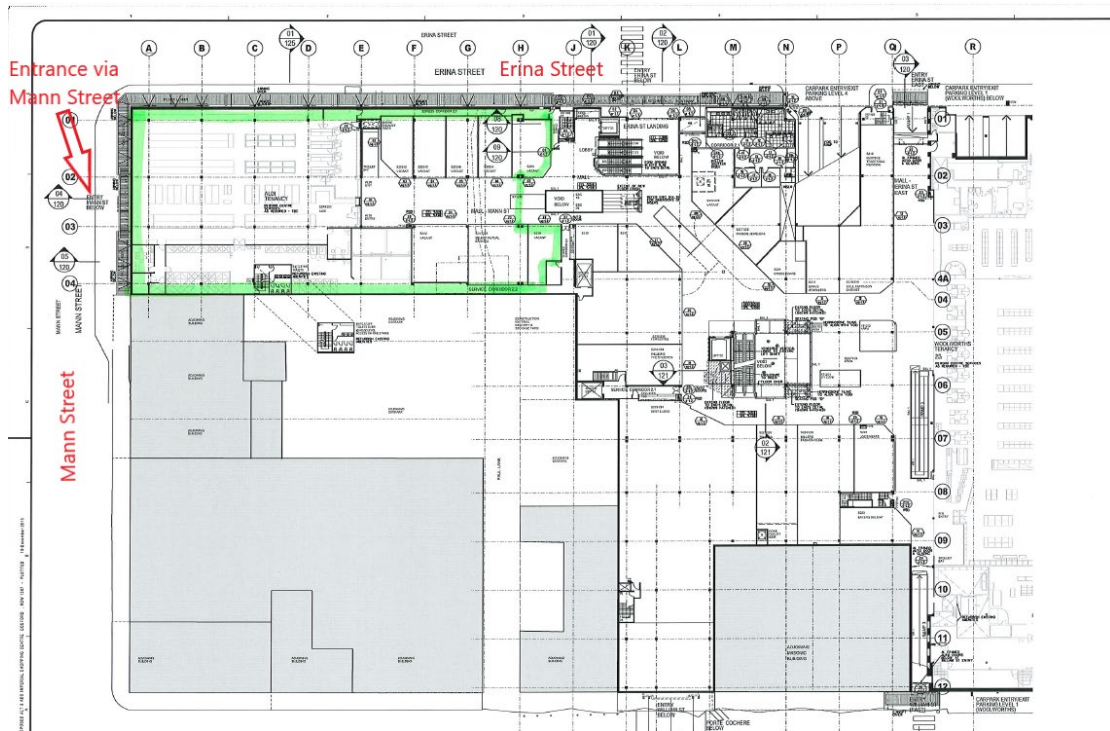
Floor plan for proposed ET Australia tenancy outline in green
